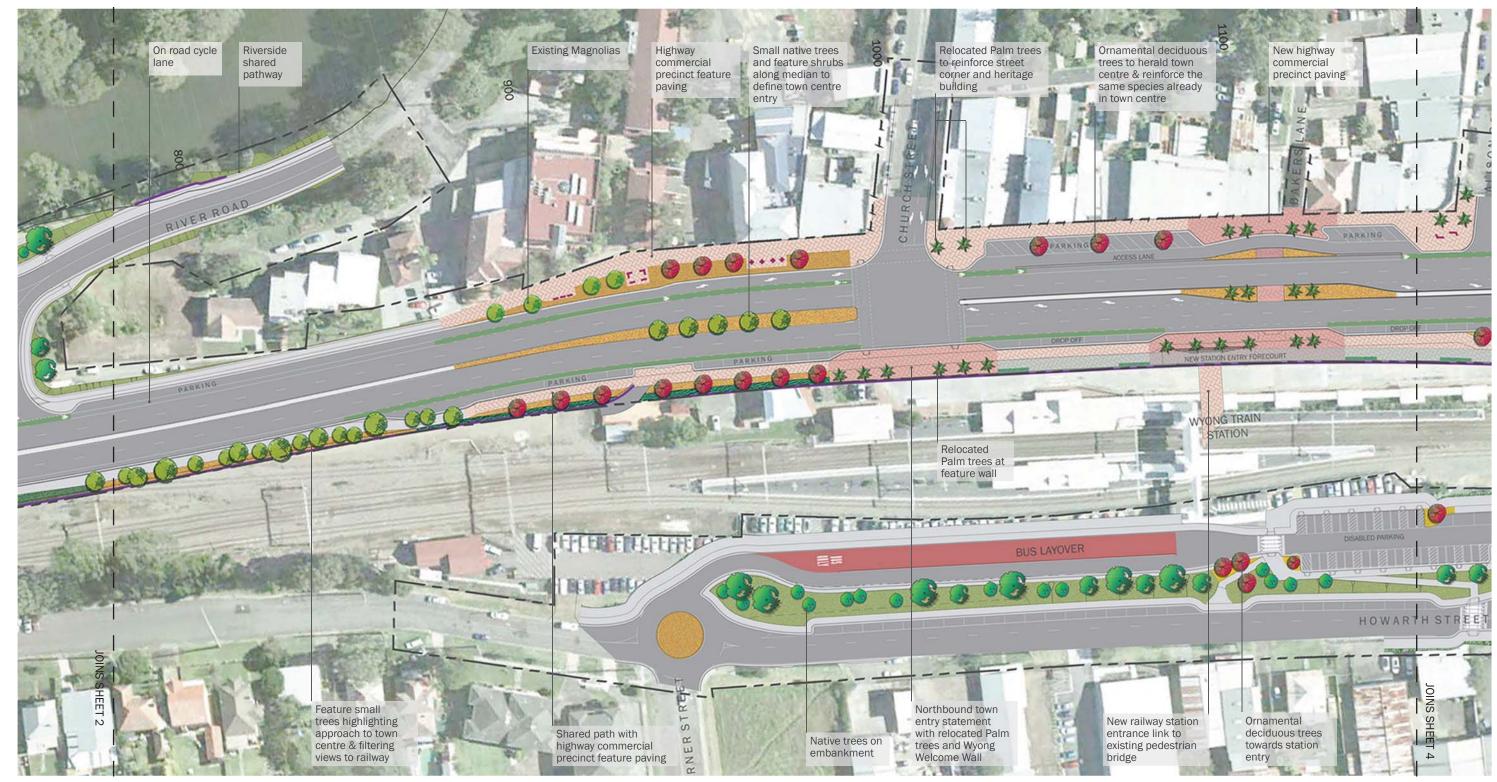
Concept Master Plan (Sheet 3; Scale 1:1000 @ A3)
